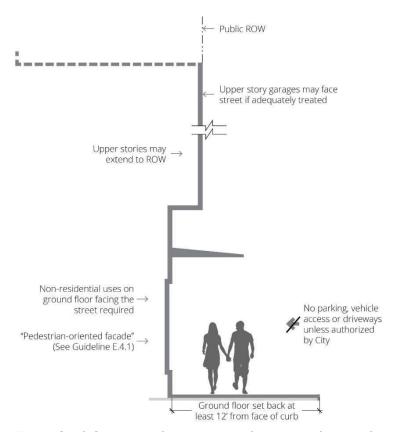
f. Summary of requirements for building facades facing a designated pedestrianoriented street. (This diagram is for illustrative purposes only. See Section C.1.2 for stated requirements.)
